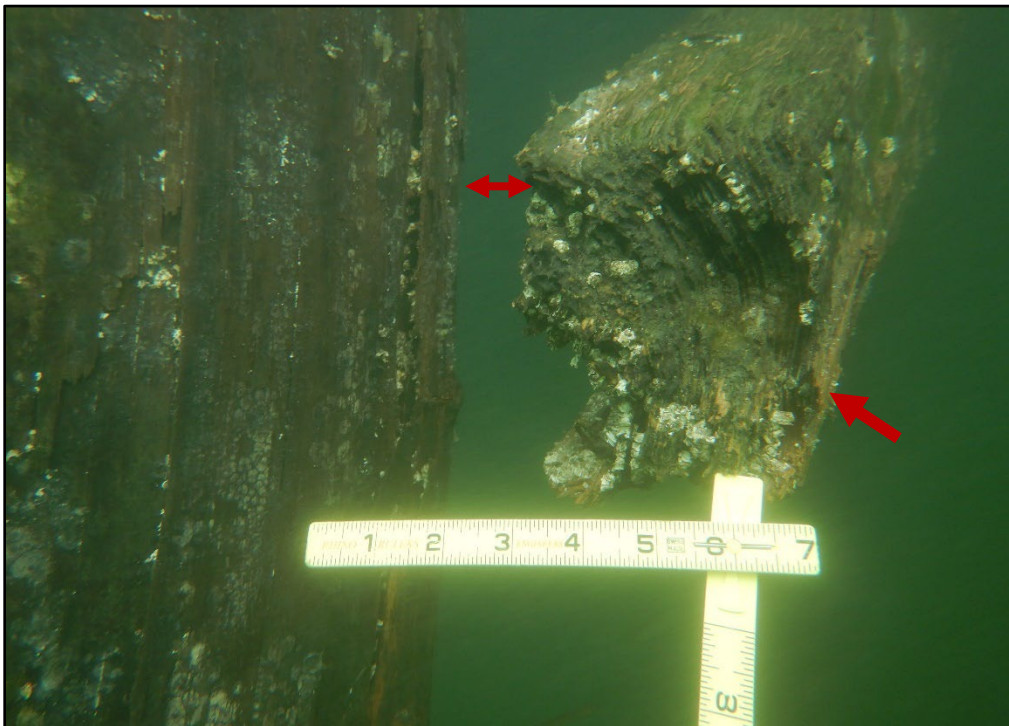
Detached lower timber pile bracing at the Coal Pier exhibiting section loss up to 40 percent and missing steel connection hardware, looking east.
